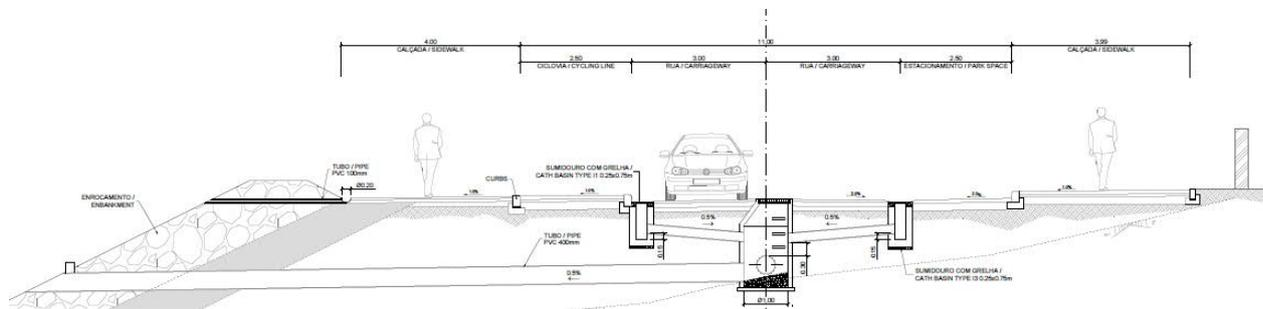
Typical section Pantufo Coastline (6+460 – 6+600 and 6+940 – 7+100).
